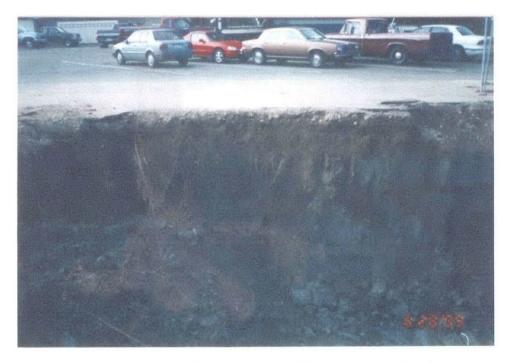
Photograph of the south wall of the excavation. Depth to pit bottom was approximately 14.0 feet.
